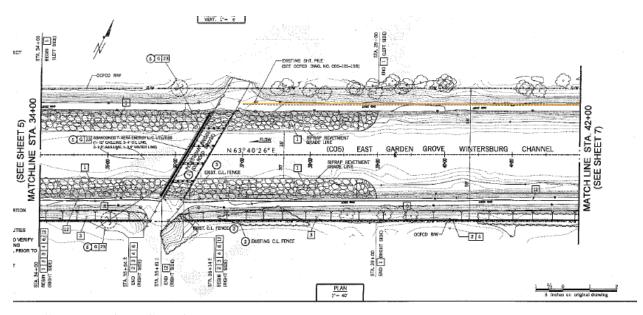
Reach 1, sheetpile begins at the pedestrian bridge on the north side. This portion of the project was completed 2 Feb 2008 (Drawing C05-101-13R), and is the with project condition.
